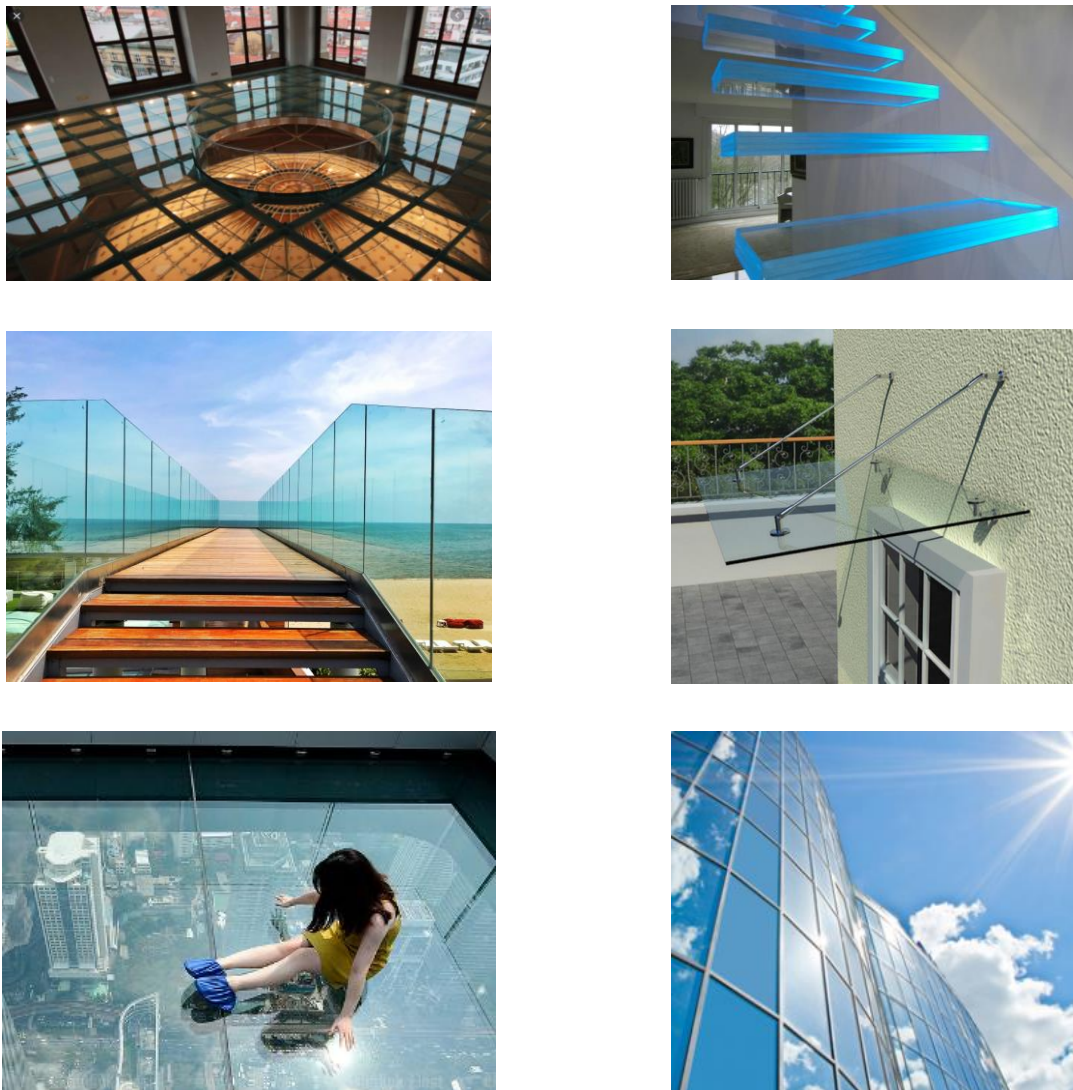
Examples of structural members made of laminated glass [15], [16]
